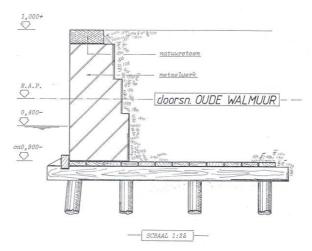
Section of a typical Amsterdam quay wall (Gemeente Amsterdam, 2023)
